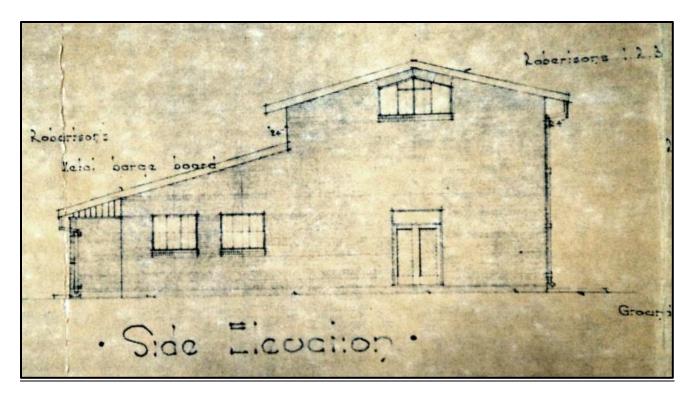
Side elevation. (NASA SAB, BAO: 4123 C167/3/505/3)
